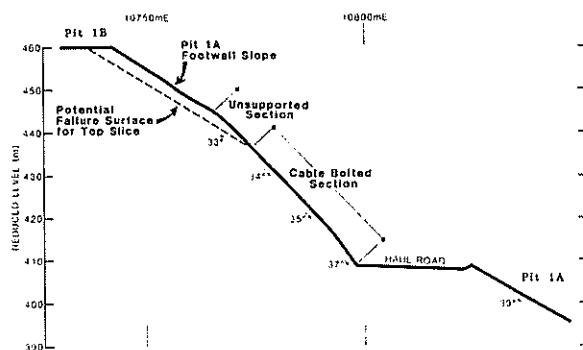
Typical Section Through Telfer Pit 1A Footwall Slope Section on 11670mN
